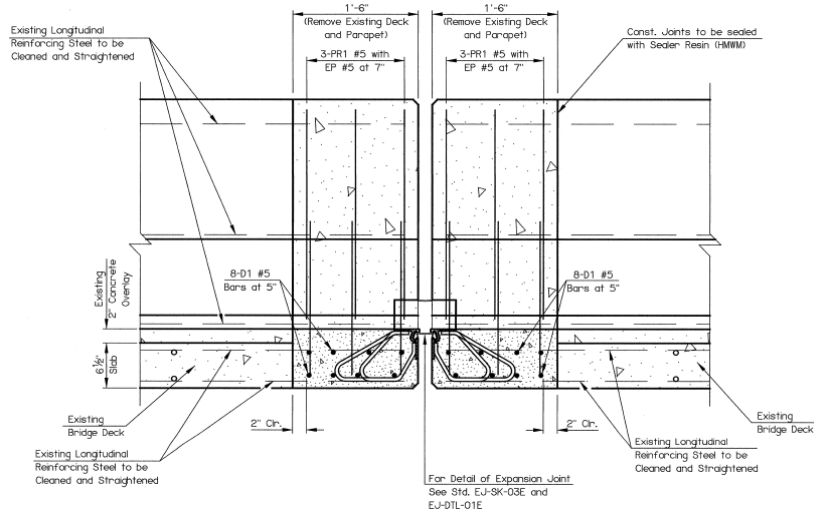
Details of the new sealed expansion joints at Pier No. 1 and Pier No. 4 for SH-3 north bridge over BNSF railroad
